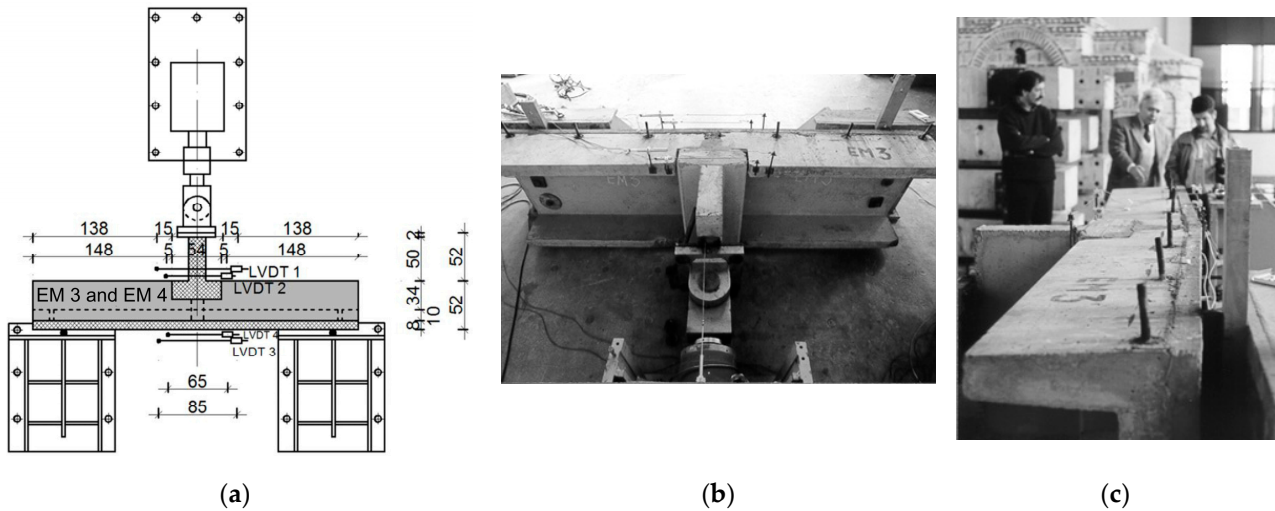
Connection floor structure to floor beam: (a) cross-section of the models EM-3 and EM-4; (b) setup of the model EM-3; (c) large deformations of the model EM-3 at the point of support [45].
